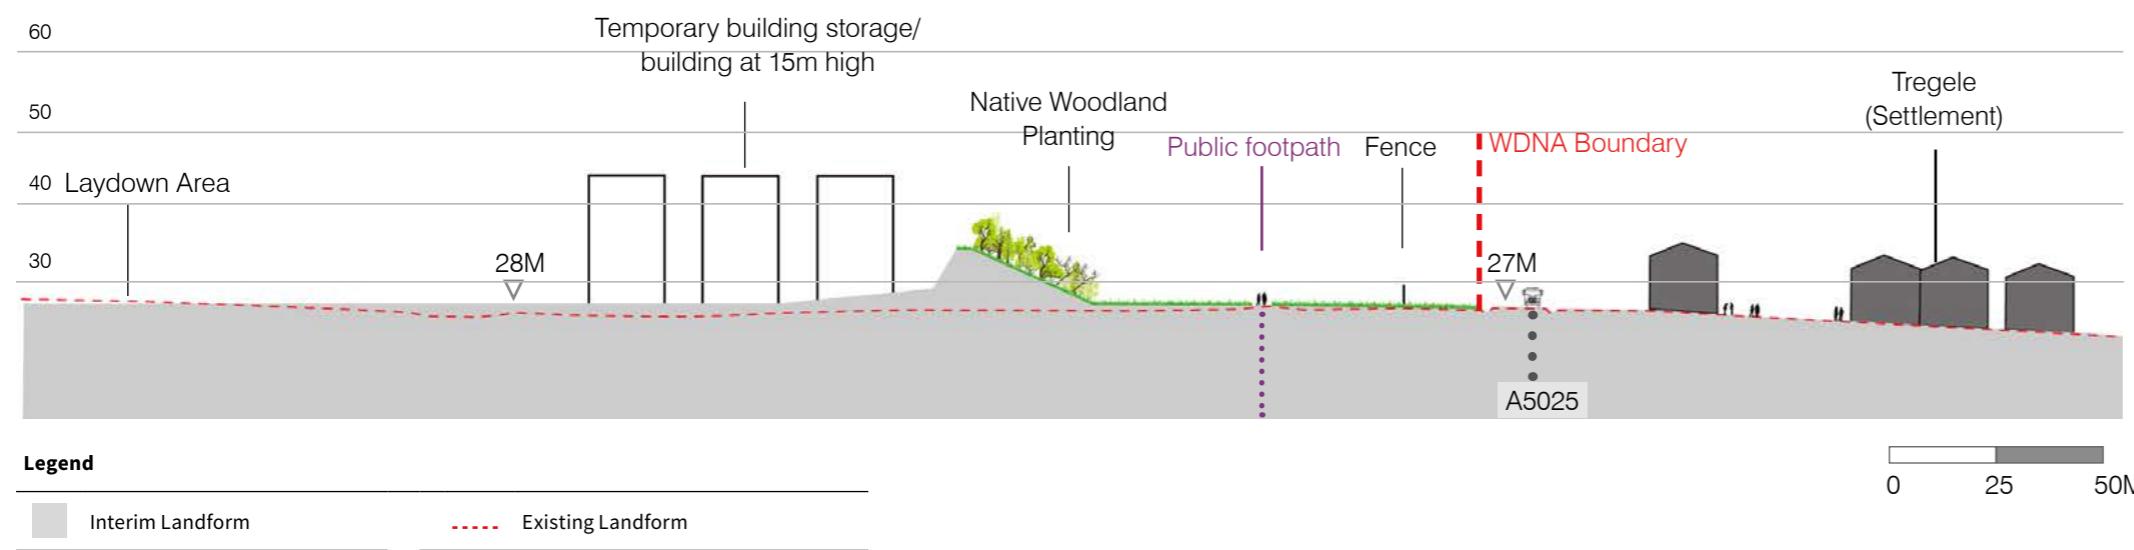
a - Illustrative section on advance planting screening along the A5025
